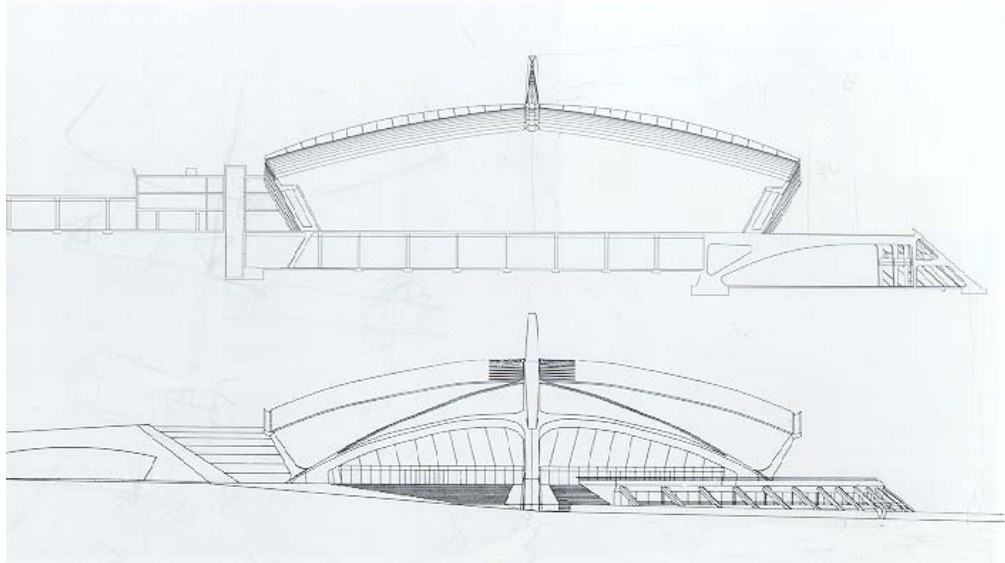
Latitudinal façade and cross-section, Tenerife Exhibition Center, 1992
